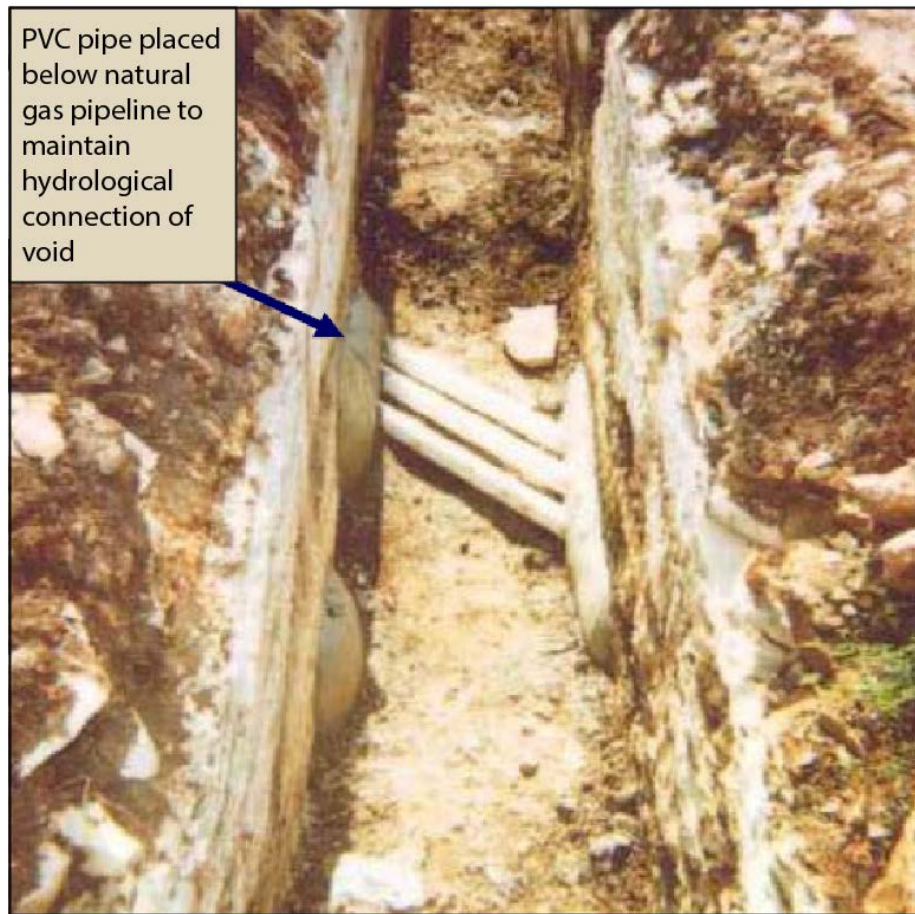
PVC Connecting Two Voids in Trench for Natural Gas Line
